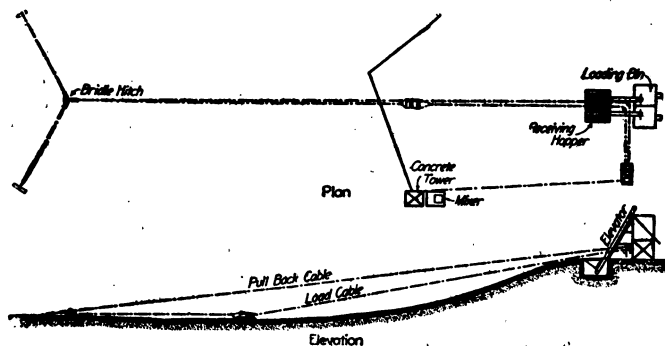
Arrangement of Cables and Plant for Scraper-Bucket Basement Excavation.
